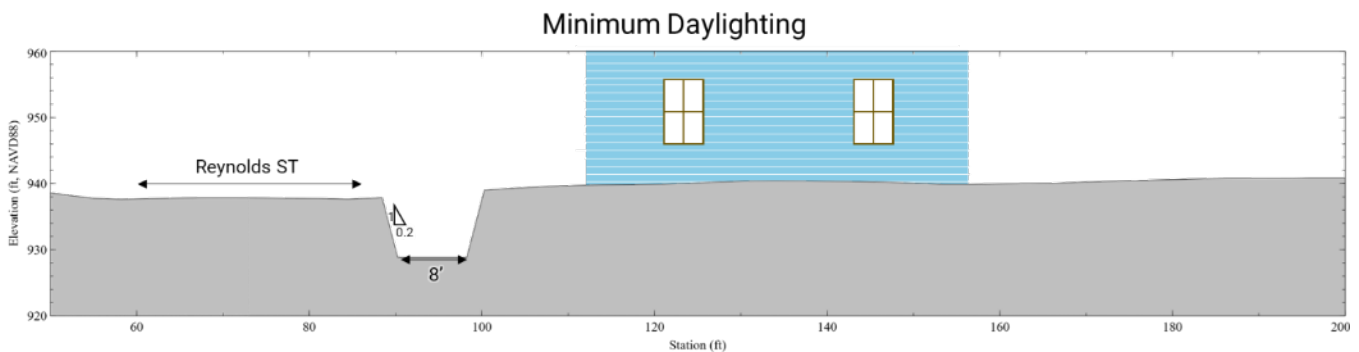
Typical cross-section for the minimum daylighting scenario looking south along North Reynolds Street.
